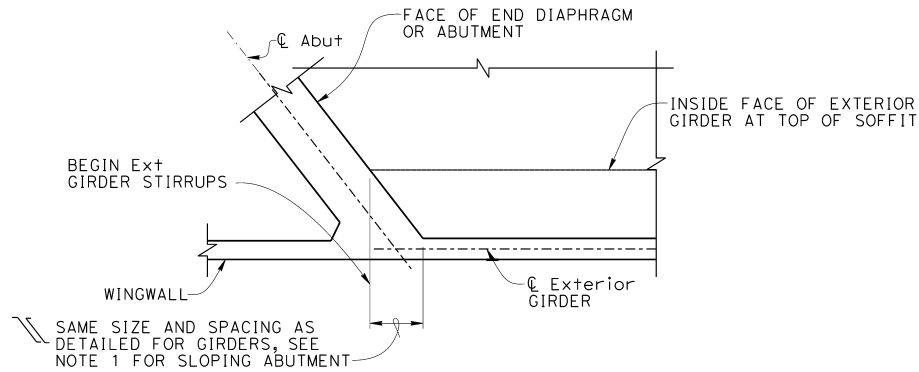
Deck Joints at Girders (Over 20° Skew)
